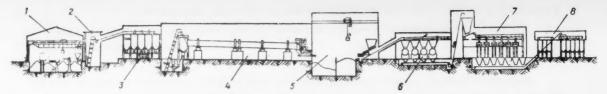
Schematic section through the bloomery iron plant: 1) raw materials stockyard; 2) preparation department; 3) charging hoppers; 4) sand department; 5) stockyard for intermediate product; 6) ball mill section; 7) magnetic separation; 8) finished product stockyard.
